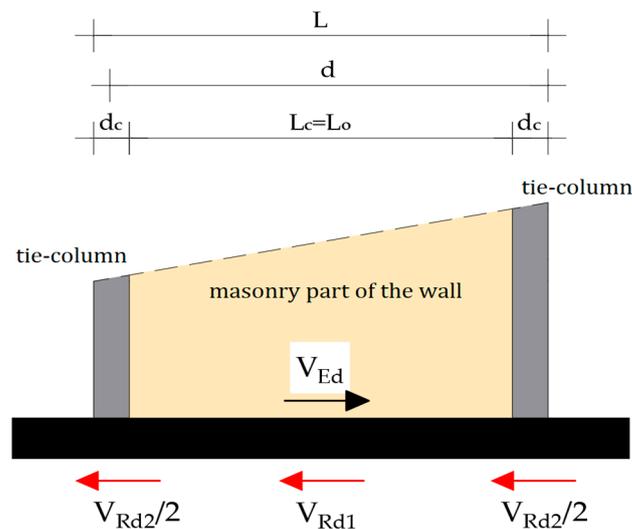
Design shear resistance model of a CM wall according to EC8-1.
